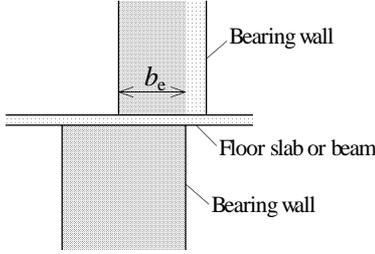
Effective part of bearing wall ( $b_e$ ) for wall ratio calculation
